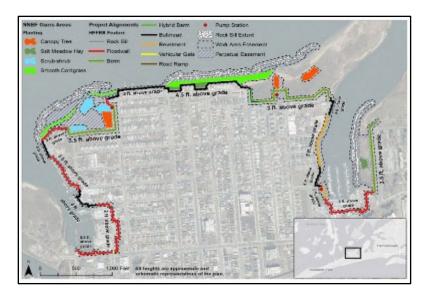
Aerial photo with showing plan layout of Arverne Area HFFRRF. Illustration credit: USACE (2018a).
